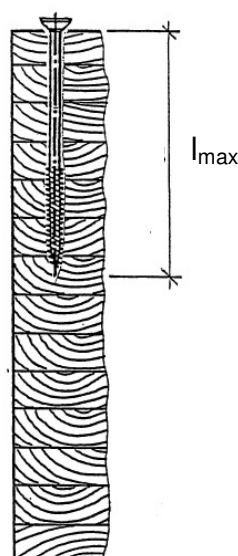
Scheme of the drill-in tests in order to determine the torsional resistance of self-tapping screws type „TT02“ (carbon steel; tested dimension: d x L = 6,0 x 300 mm; maximum screw-in depth: $l_{\max} = 294$ mm)
